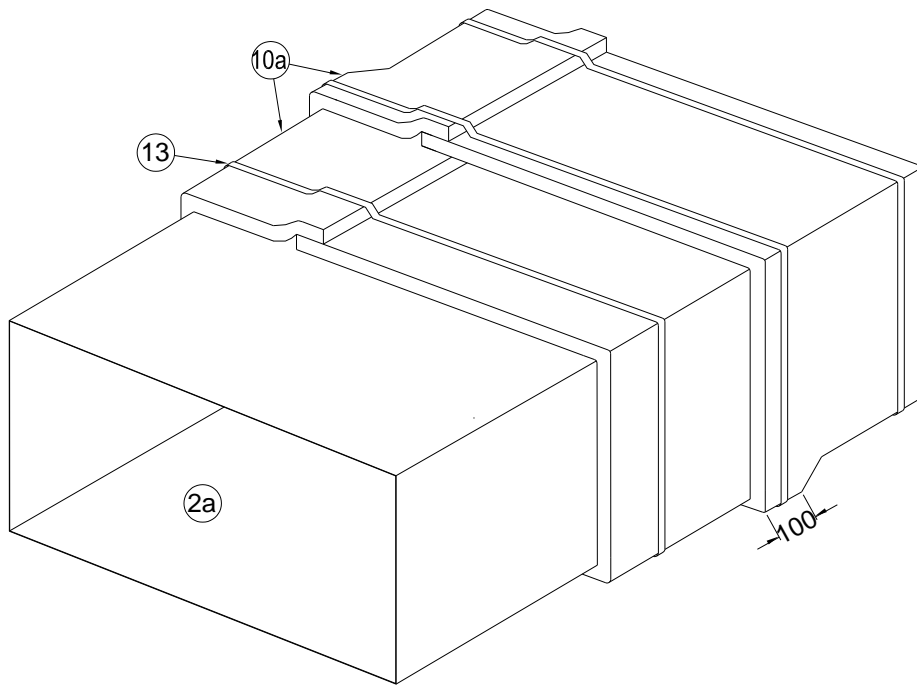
Typical Details of Horizontal Assembly Duct Jointing and Support
